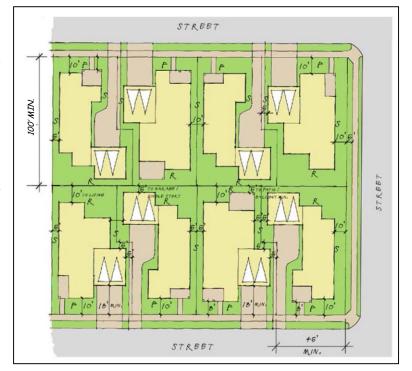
A: Example of a Small Lot Single-Family Traditional Subdivision
